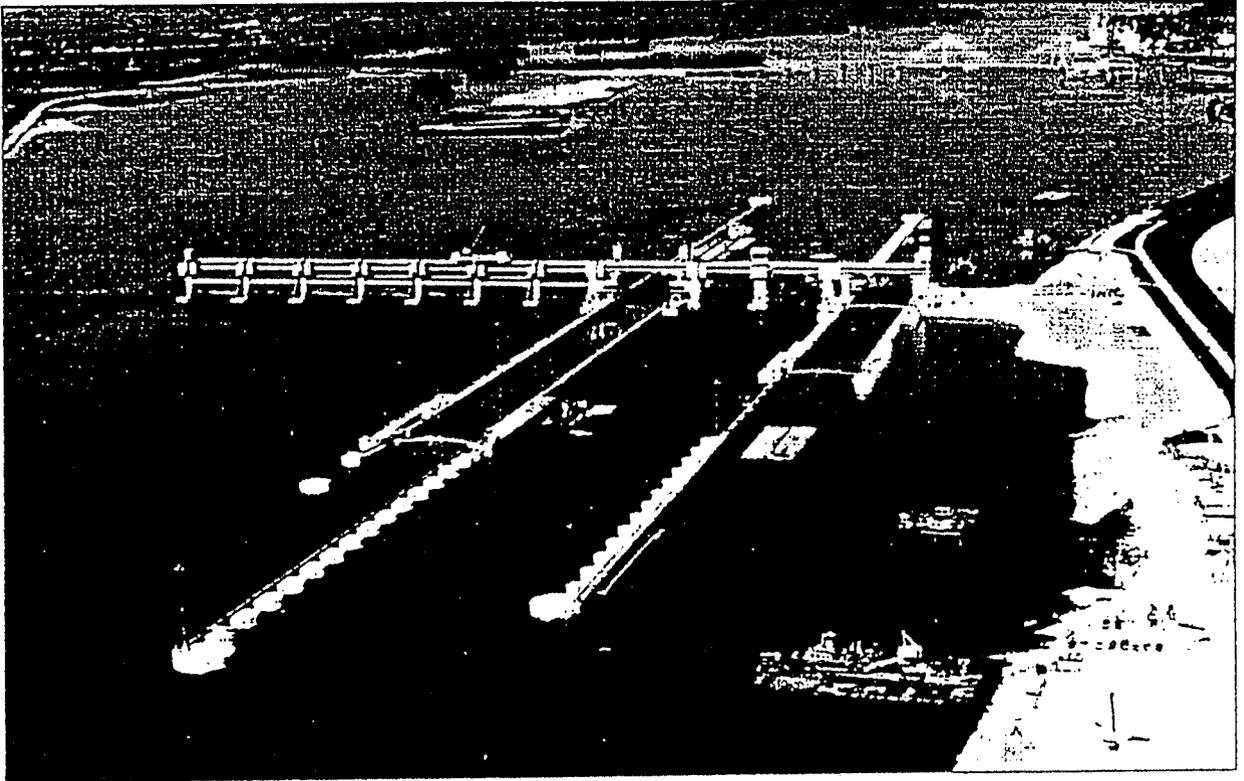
Typical low-lift navigation lock and dam (Ables and Boyd, 1966).
